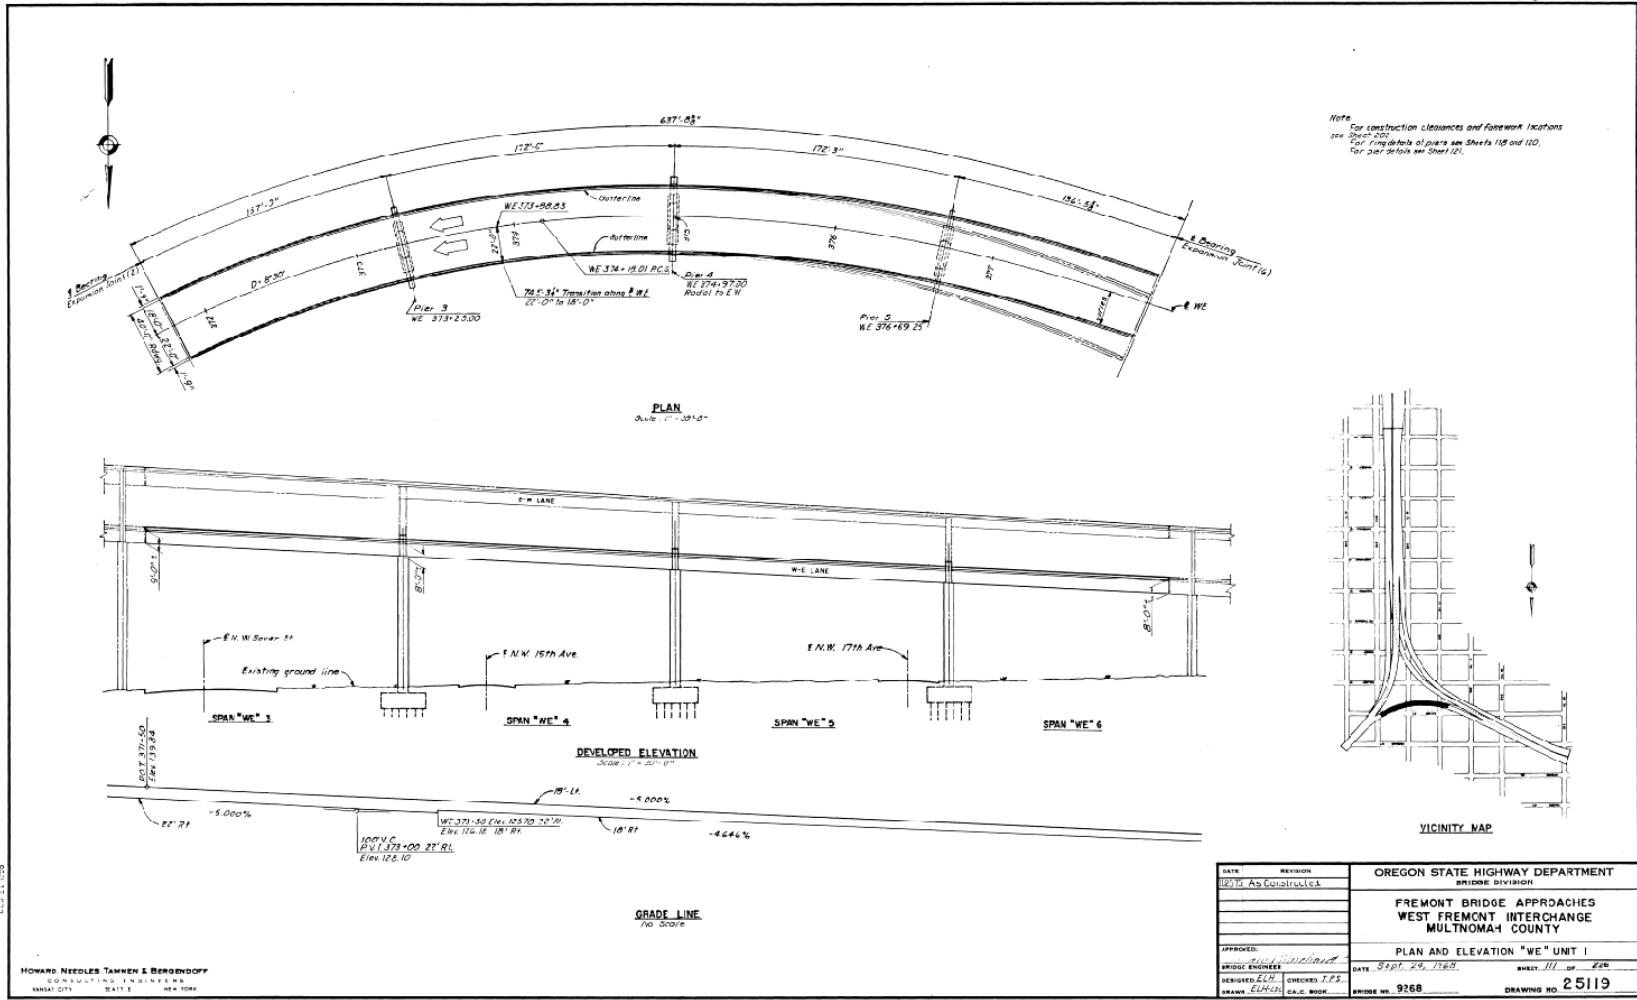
Plan and elevation views of WE Unit 1 Bridge superstructure 09268E.
